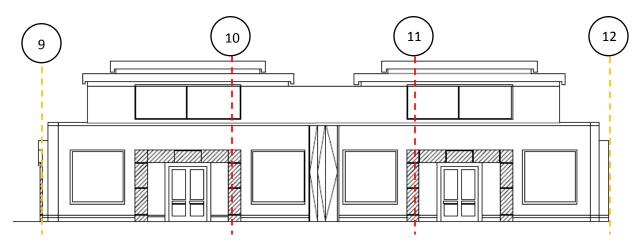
North Elevation of Ballroom | Proposed Location of Clerestories
